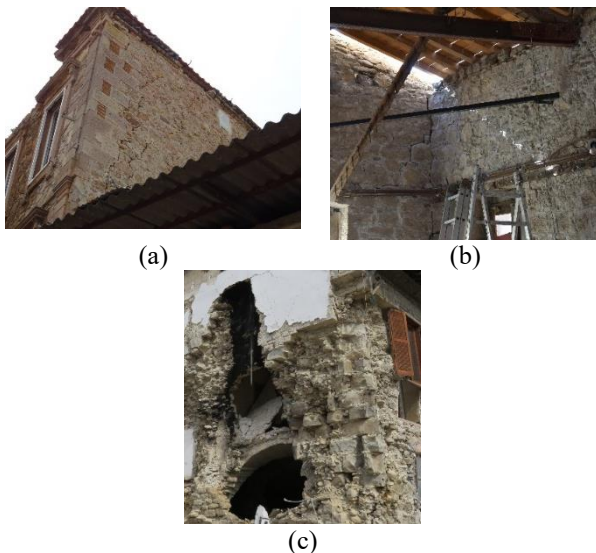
(a) Solid connection of cross walls, (b) Almost vertical crack suggesting a deficient connection between walls, (c) Lack of connection between the exterior and the interior leaves of the three-leaf masonry walls.
